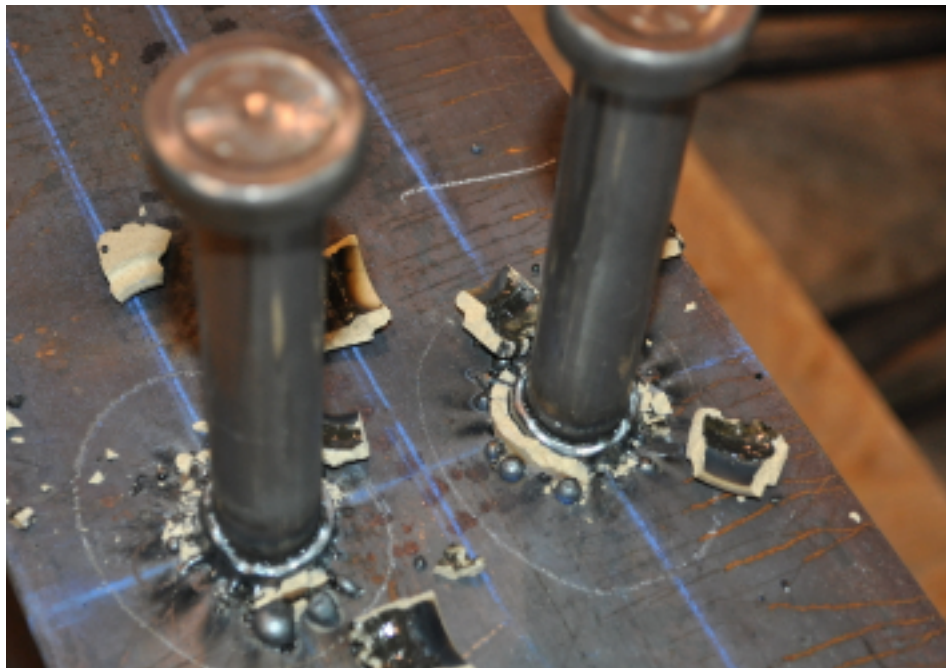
A pair of headed shear stud connectors welded to a steel flange
